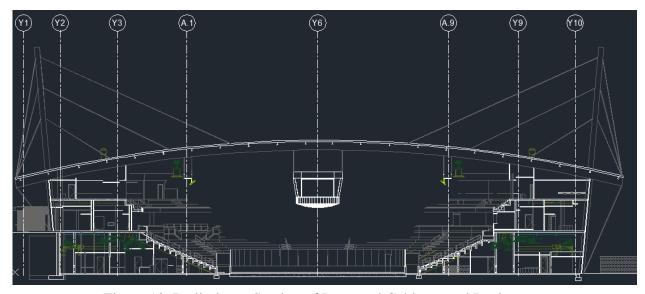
Preliminary Section of Proposed Cable-stayed Design
